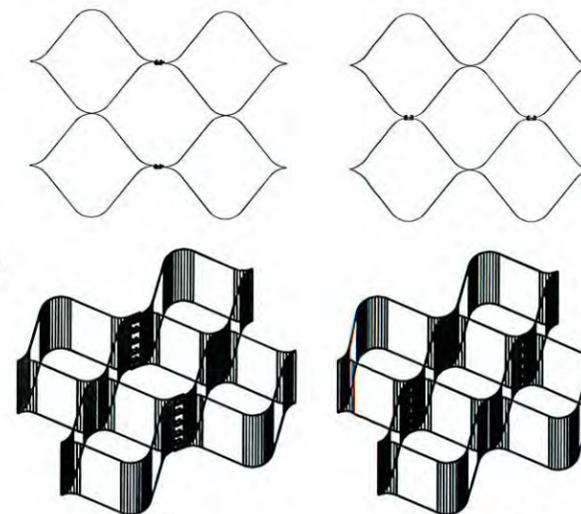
FIGURE A SIDE CONNECTION DETAIL - INTERLEAFED
